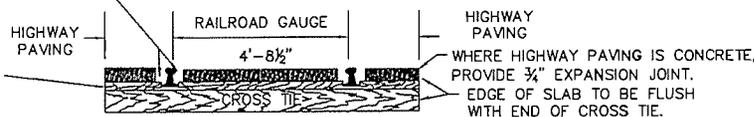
DETAIL OF CONSTRUCTION FOR SINGLE TRACK
